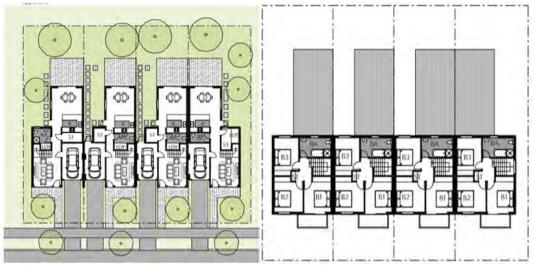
SITING TERRACE HOUSING (SOURCE: DPIE)
